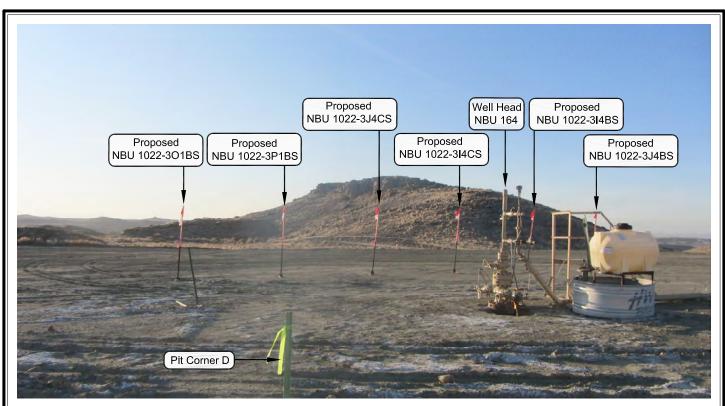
PHOTO VIEW: FROM PIT CORNER D TO LOCATION STAKE
